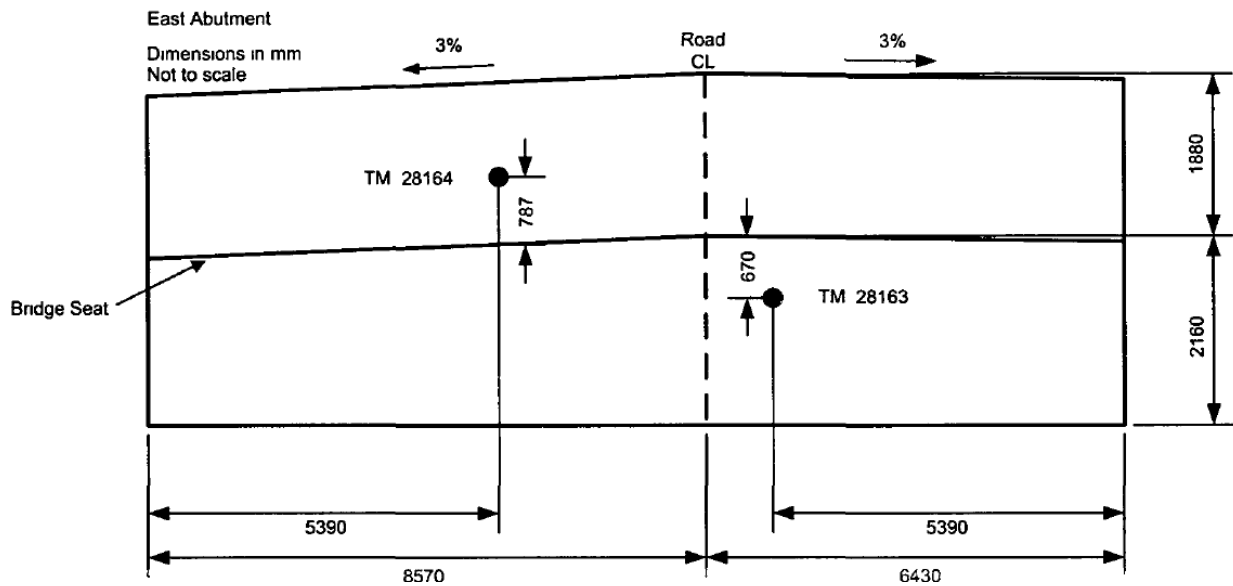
Tilt meter locations on the east abutment. A similar configuration was used for the west abutment (Huntley, 2009).
